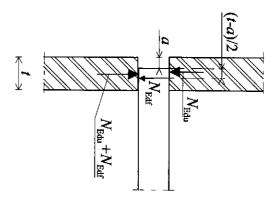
Diagram showing the forces when a floor is supported over a part of the thickness of a wall
